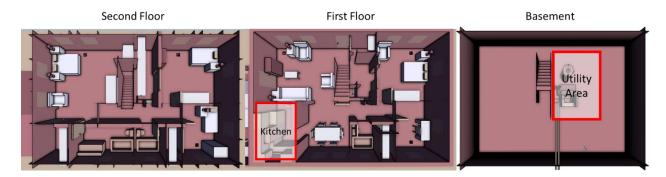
Top-down view of each floor: second floor (upper left), first floor (upper right) and basement (bottom).
